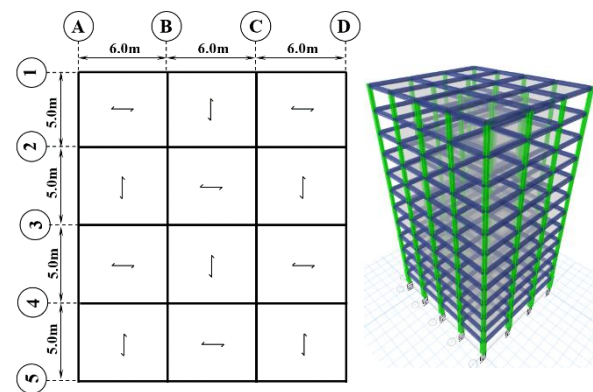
Typical plan of the building model and finite element model of 12 story RC building
